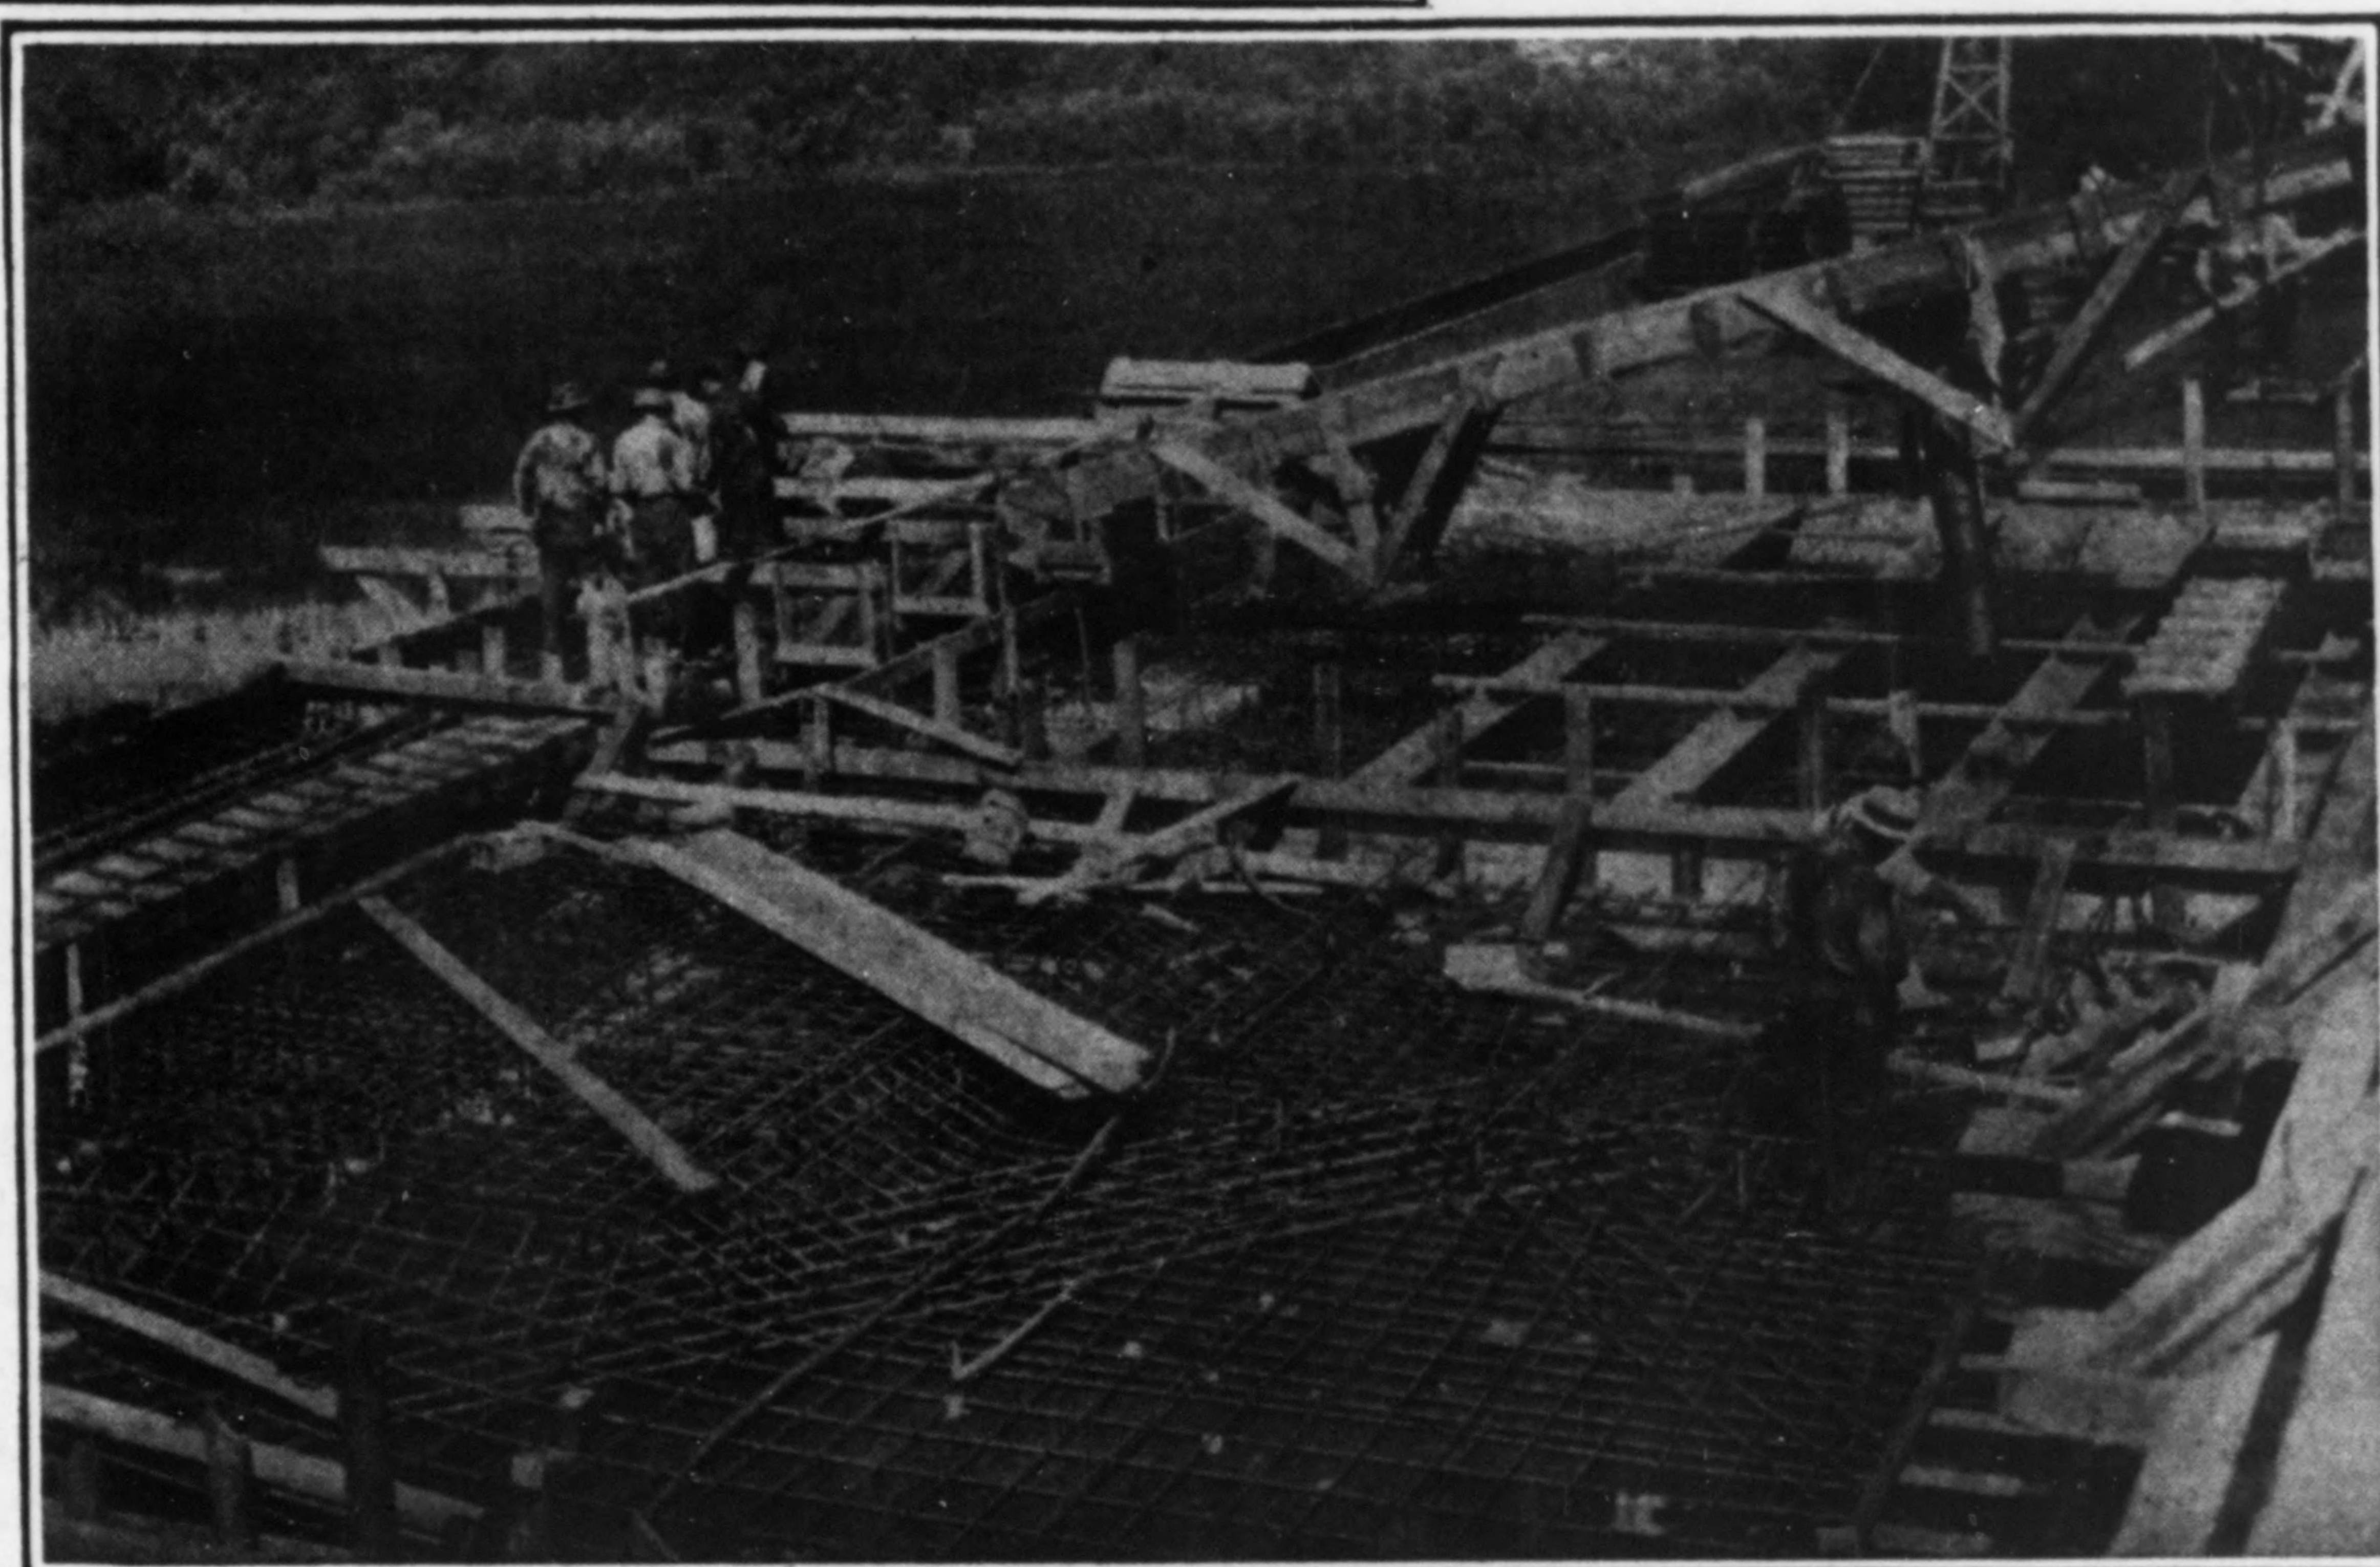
(BELOW) CONCRETING THE FLOOR SLAB
